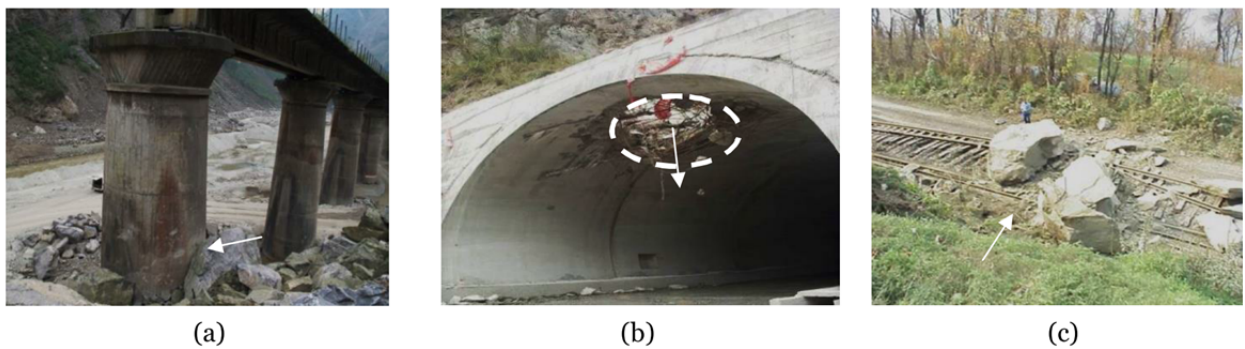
Rockfall hazards. (a) To bridge, (b) to tunnel, (c) to railway.
